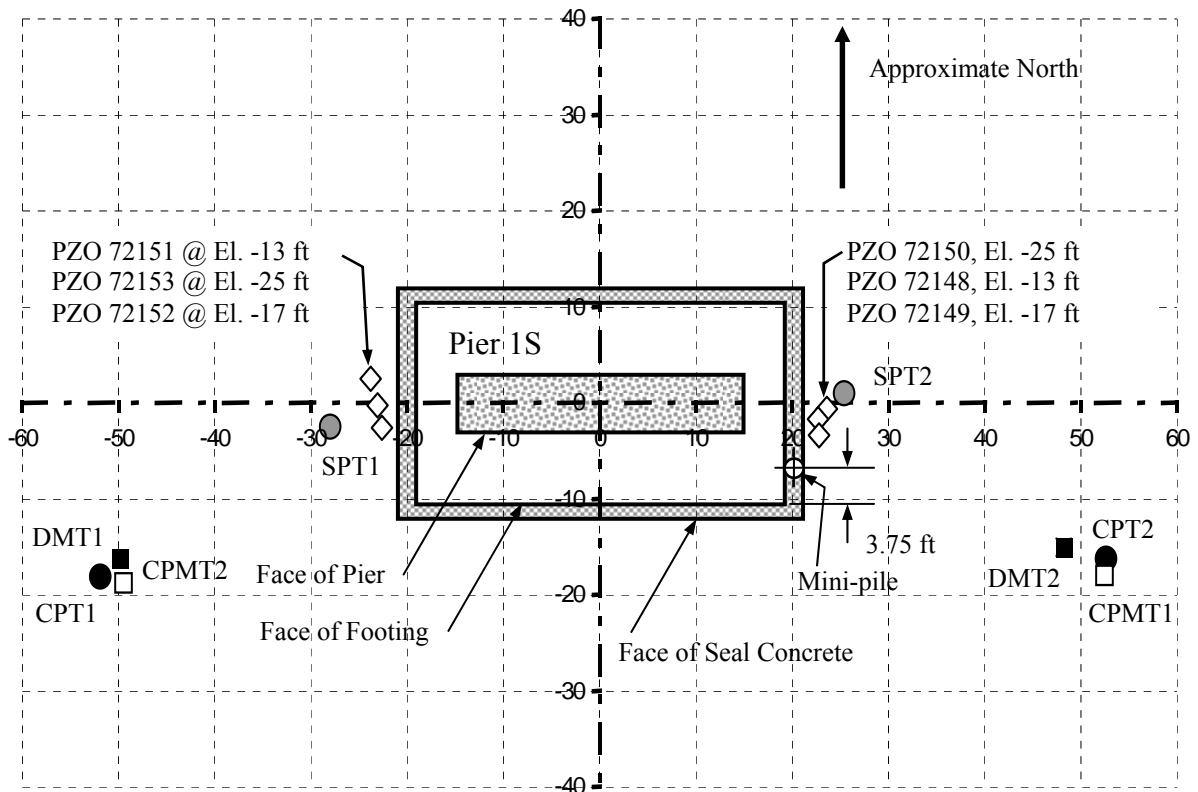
Location Plan for Pier 1S Borings, Soundings, and Instrumentation
